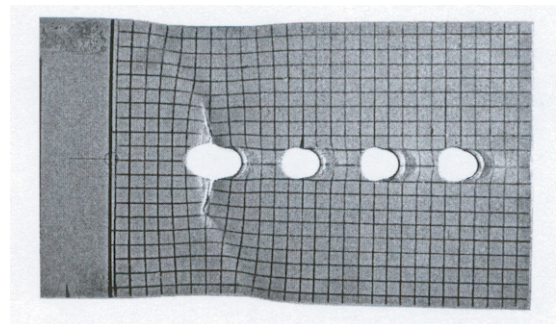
Net cross section plate fracture (photo courtesy of Darko Beg).
